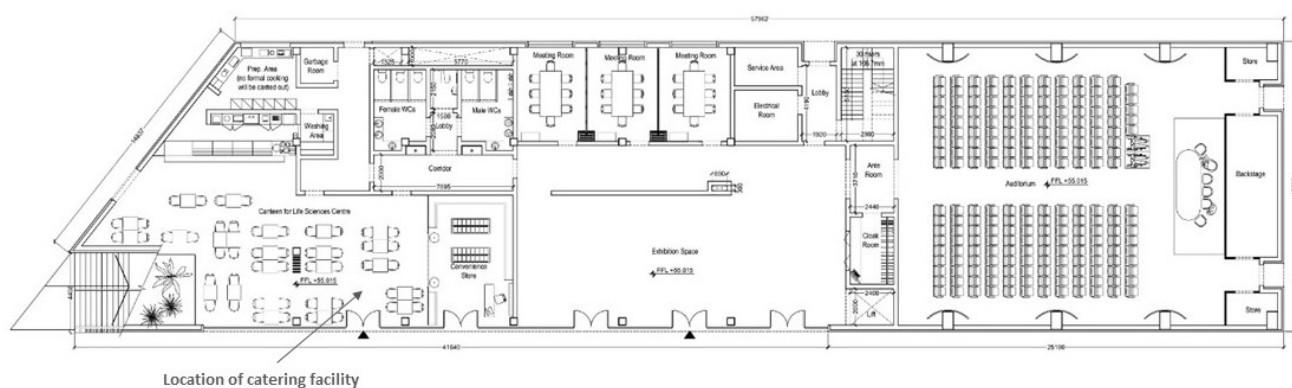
| LS4 floor plan highlighting the location of the catering facility
